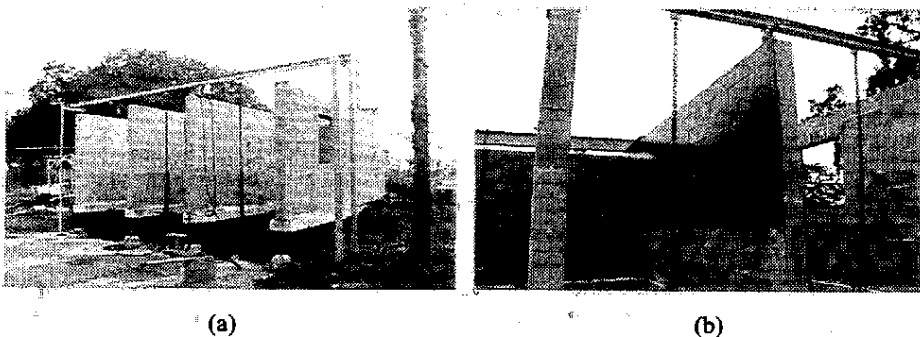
(a) View of walls and reaction frame (b) Repaired wall.
